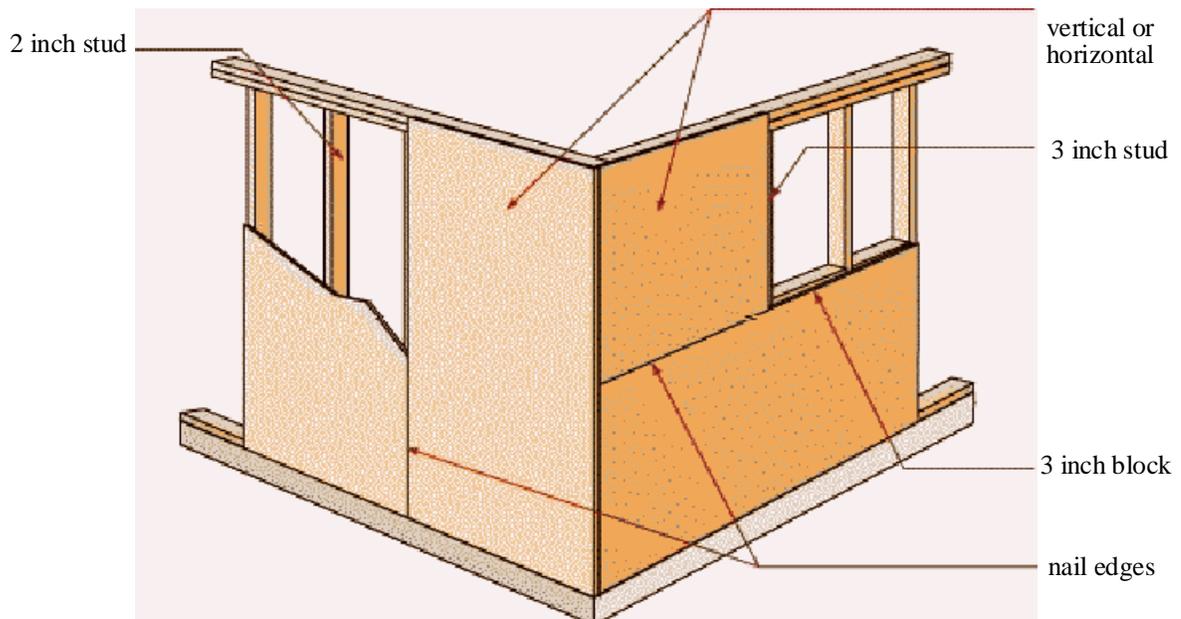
Install Sheathing Vertical or Horizontal
